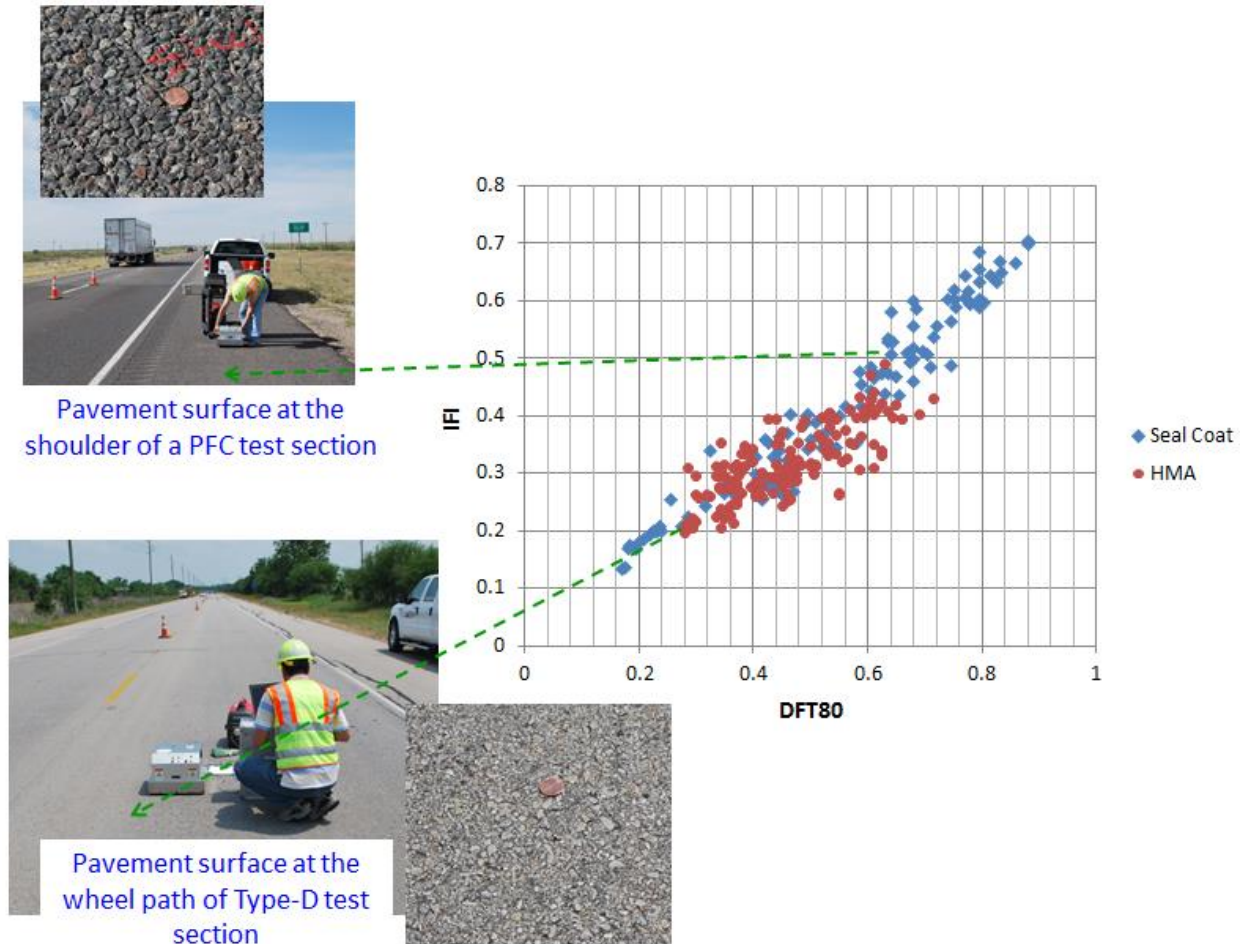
Correlation between IFI and DFT80 for Hot Mix Asphalt and Seal Coat Test Sections and Pavement Surface Condition for Asphalt Mixture Test Sections
